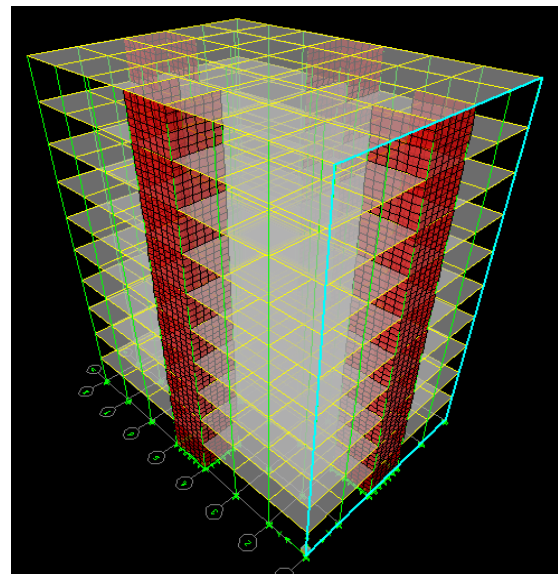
3-Dimensional View of 10 storied structure with Channel shear wall
